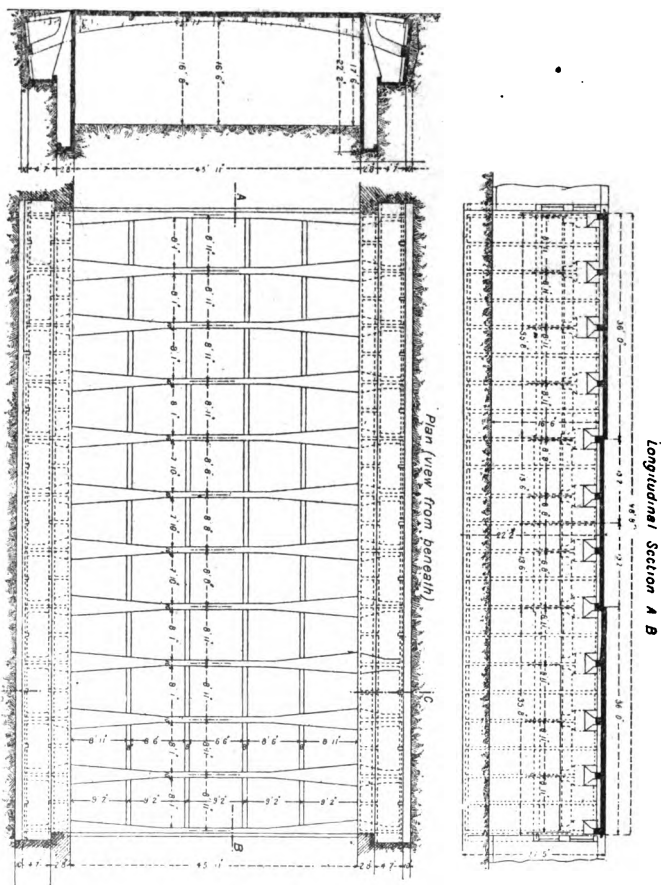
Details of Arched Bridge of 46 ft. span.
